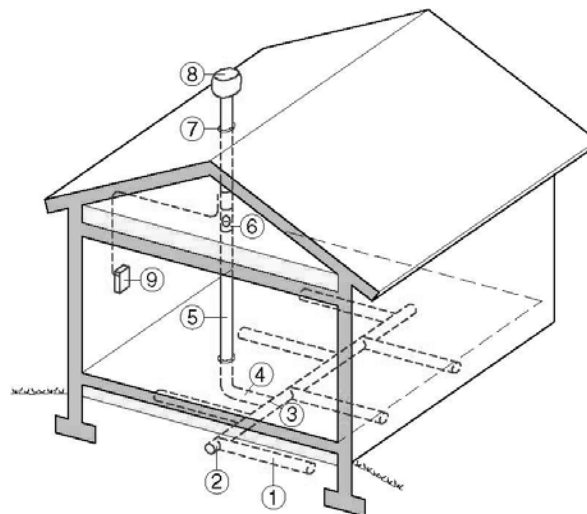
A schematic figure on radon piping: (1) suction (radon) piping, (2) collector duct, (3) air removal point, (4) transmission duct, (5) exhaust duct, (6) damper, (7) roof follow-through, (8) exhaust fan and (9) possible electric regulator system for the fan. Fig. from RT 81–1079 (2003) /2/.
